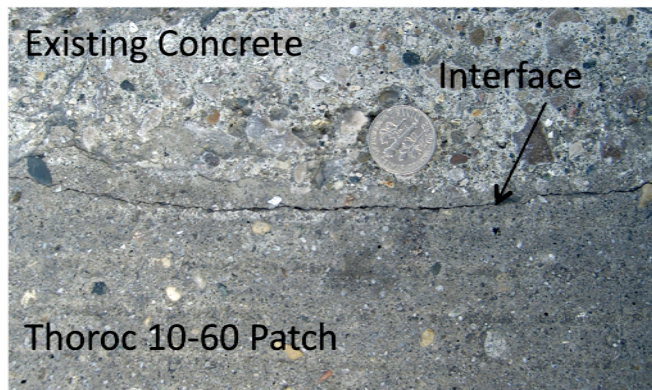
Interfacial delamination between Thoroc 10-60 patch repair and existing concrete, on September 18, 2009.
